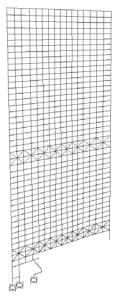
Buckled shape of north perimeter frame in Stage 6 of the global Model (looking northeast)
